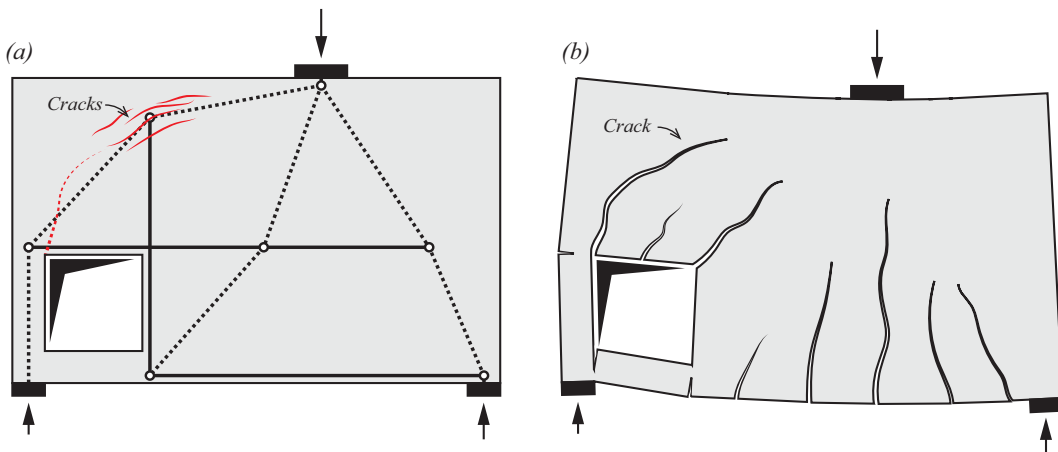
Potential problems of a STM resulting in a reinforcement layout without any crack control reinforcement: (a) statically admissible solution; (b) corresponding deformed shape
